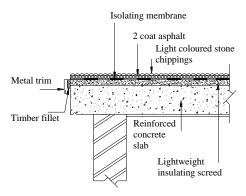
Reinforced concrete flat roof (with asphalt covering)
